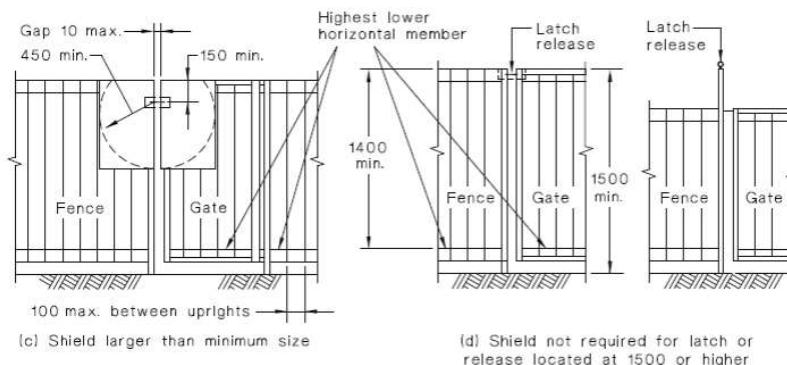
Alternative Latch Shielding options for gates of open construction part (d)
